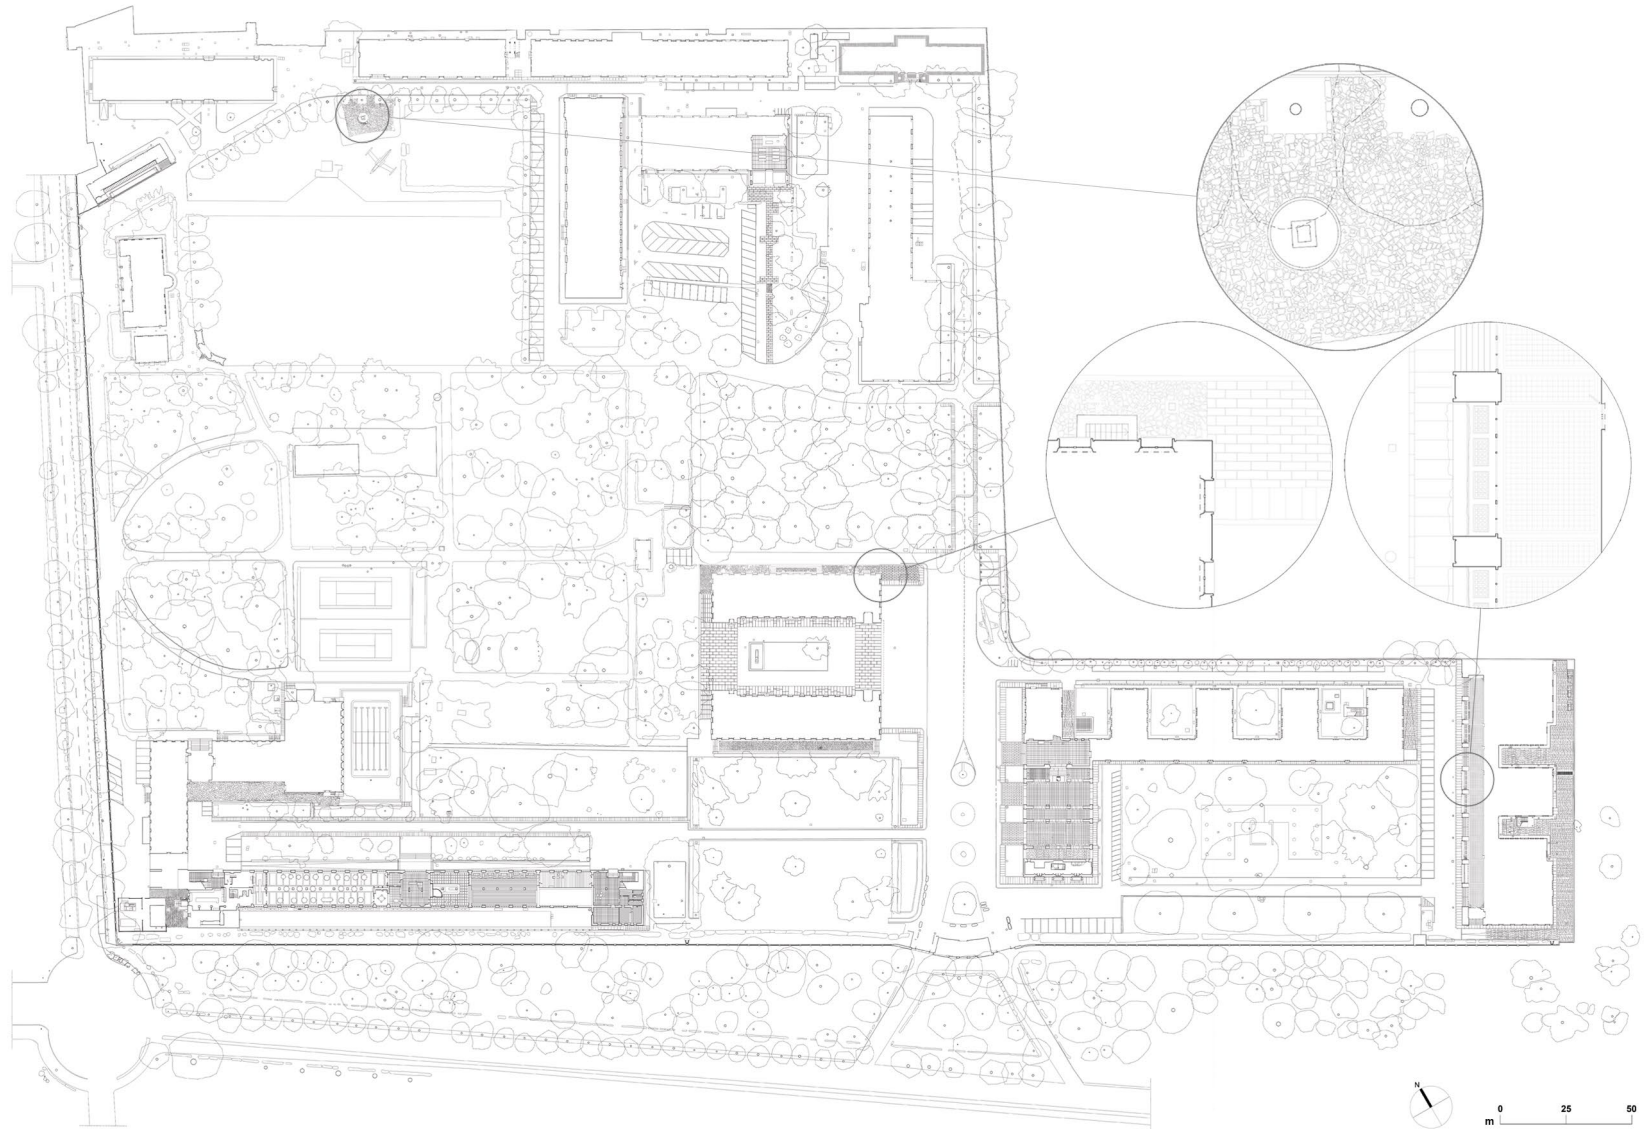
General plan layout and details of some pavings of the Air Warfare School complex
